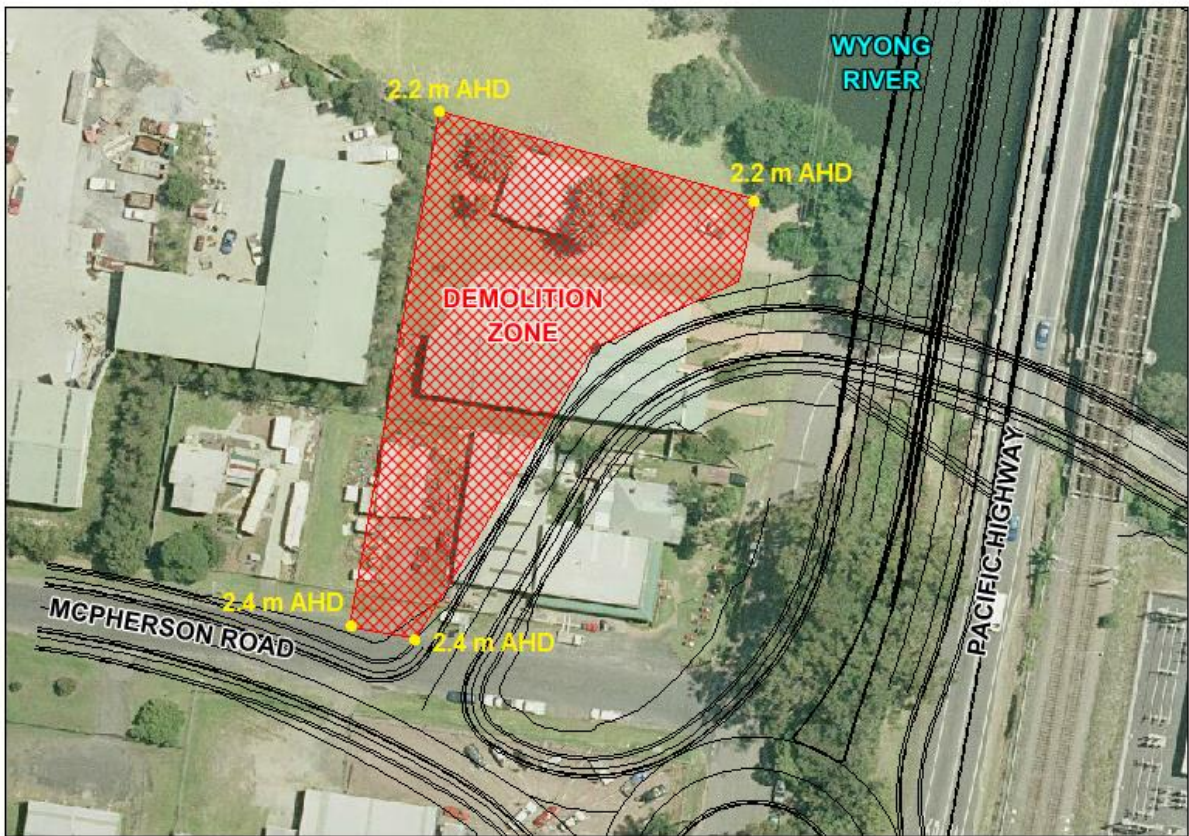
Proposed Excavation at 204-206 and 210 Pacific Highway, Tuggerah
